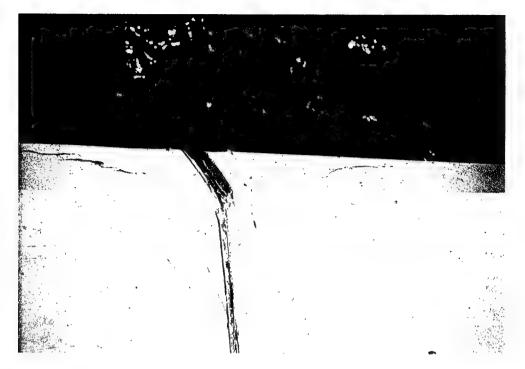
Cracking along lakeside edge at joint 52/53 south seawall monolith S52
